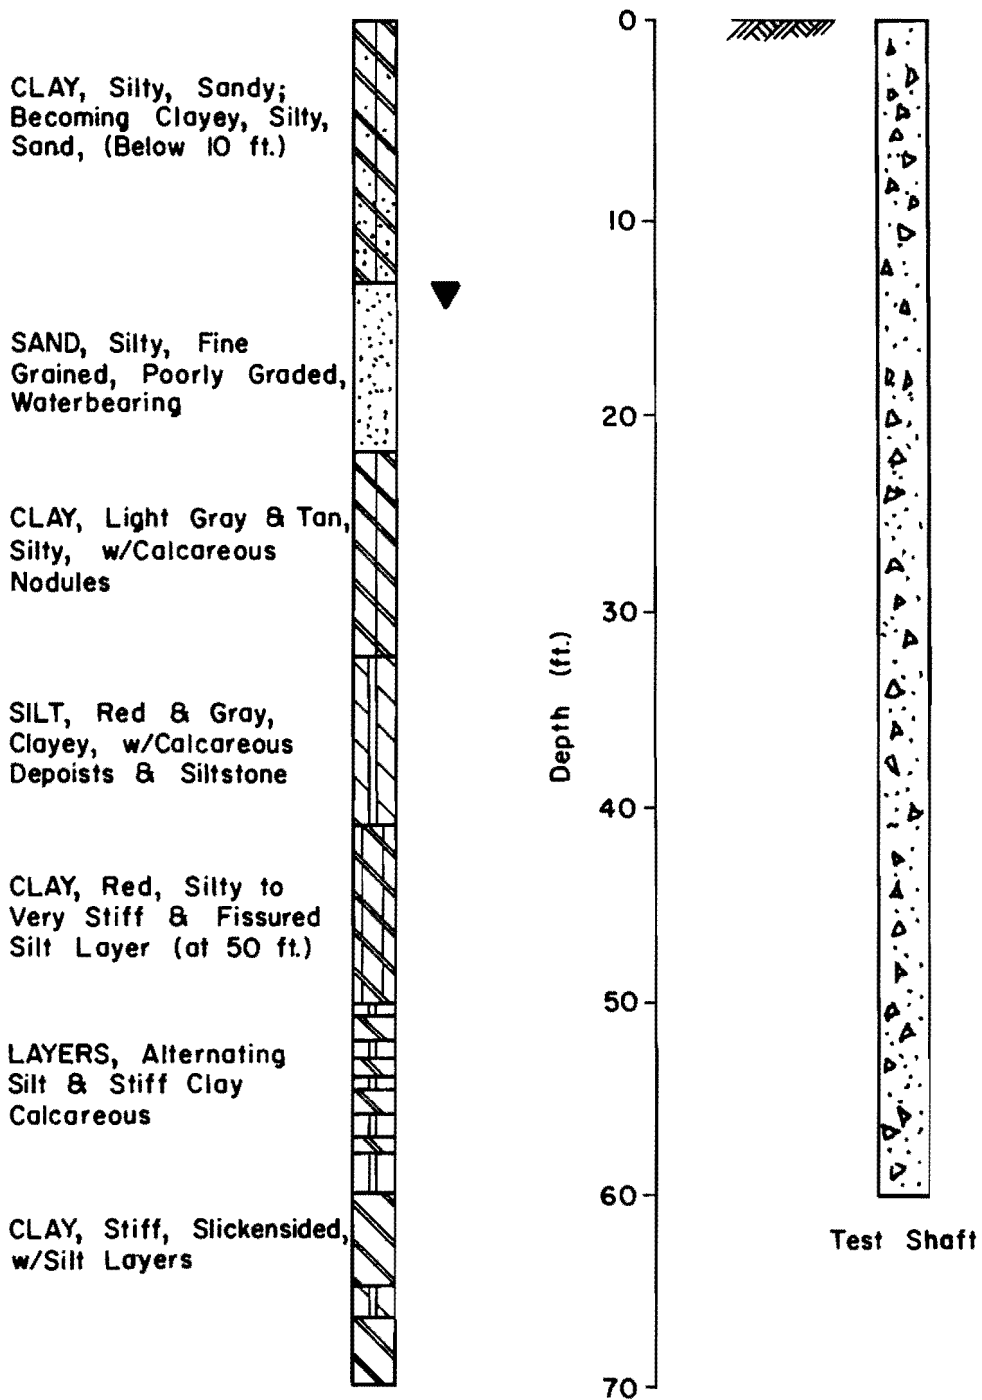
Soil and shaft profile, HB & T test site (Site IV) (After Barker and Reese, 1970).
